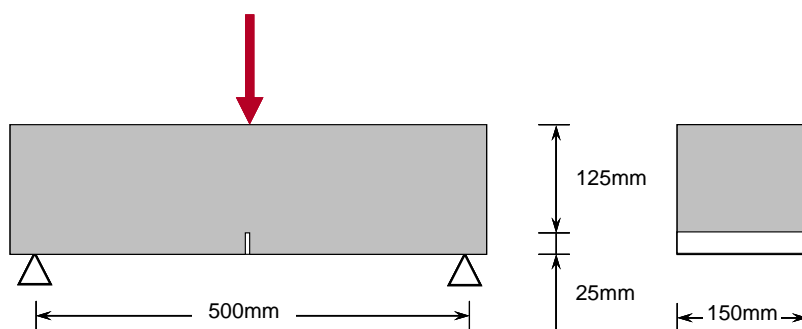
Test setup according EN 14651: 3-Point bending test on a notched specimen
